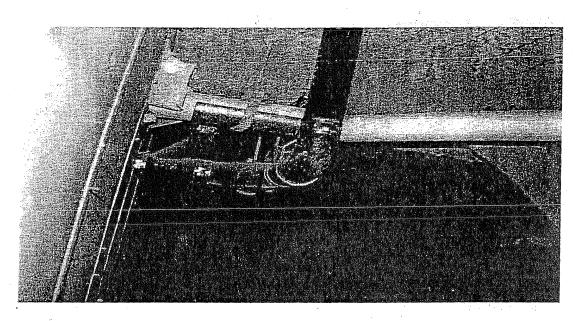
Sub Junction Level, Concealed Space between East 2-hour Shaft Wall of Room SJ1, looking North.
